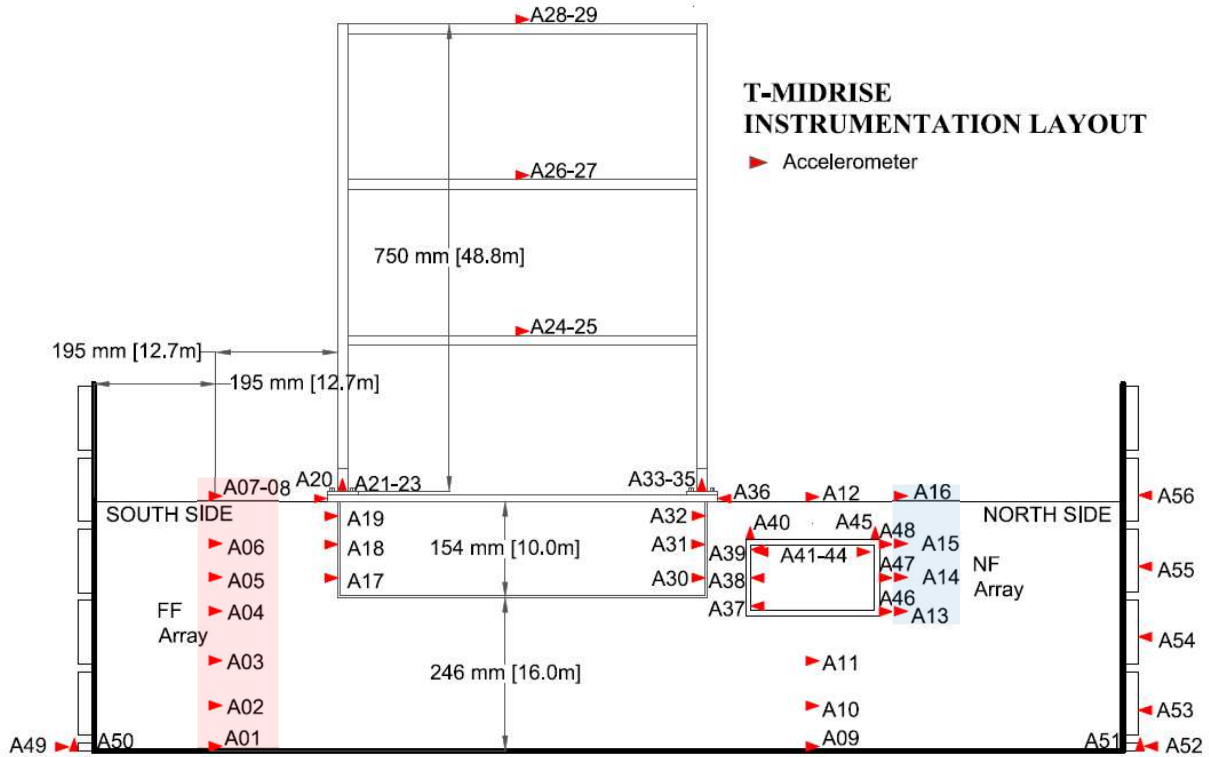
Elevation view of accelerometer layout in T-Midrise.
